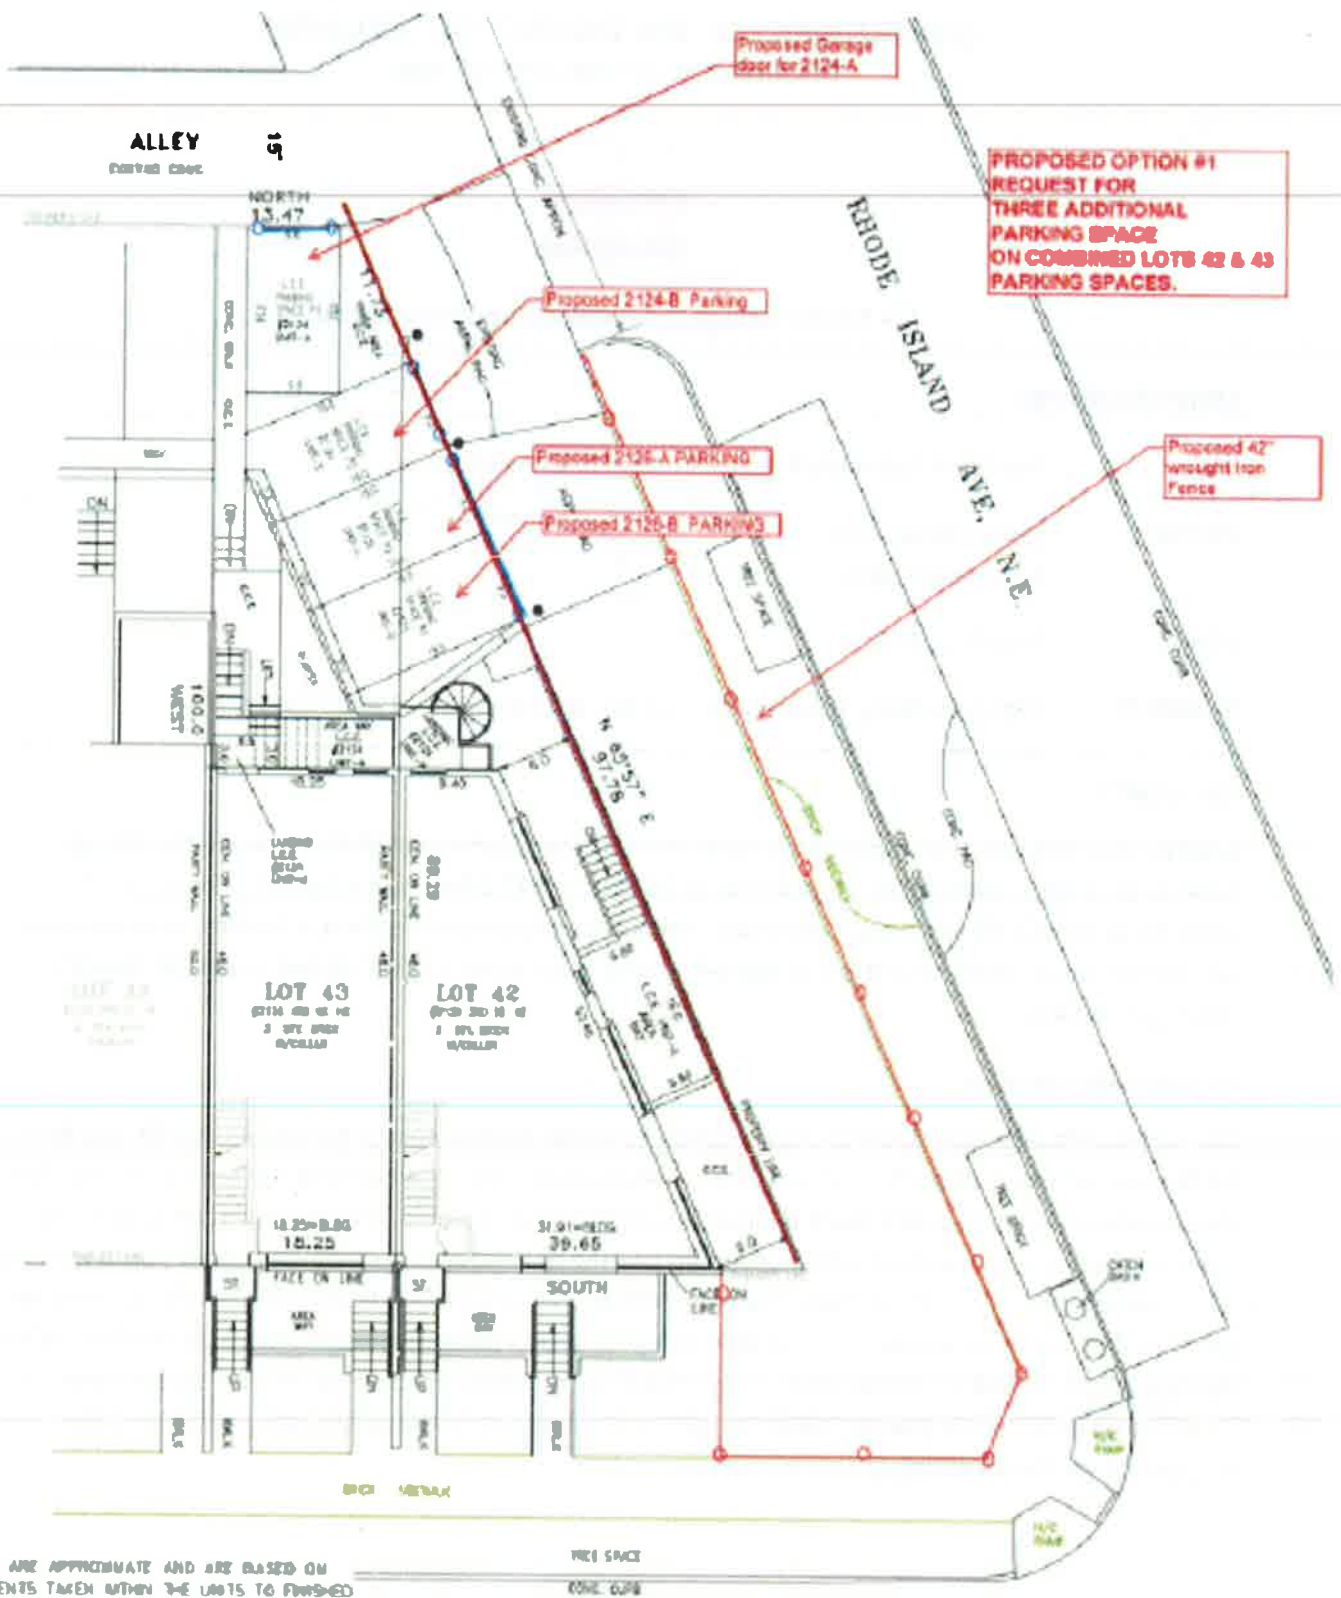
Site Plan for Lots 42 and 43 (Source: The Applicant)
